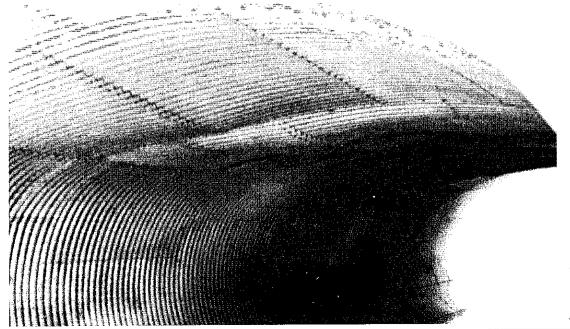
Big Mountain Creek culvert - deformation of crown of culvert prior to failure.
